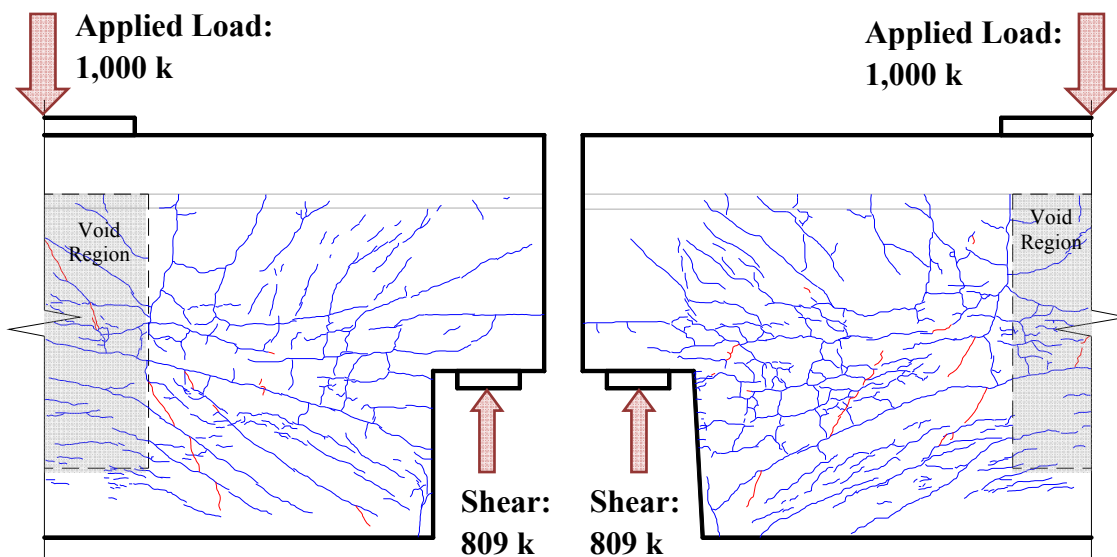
Cracking in beam on the east (left) and west (right) sides of the beam at a load of 1,000 kips.
